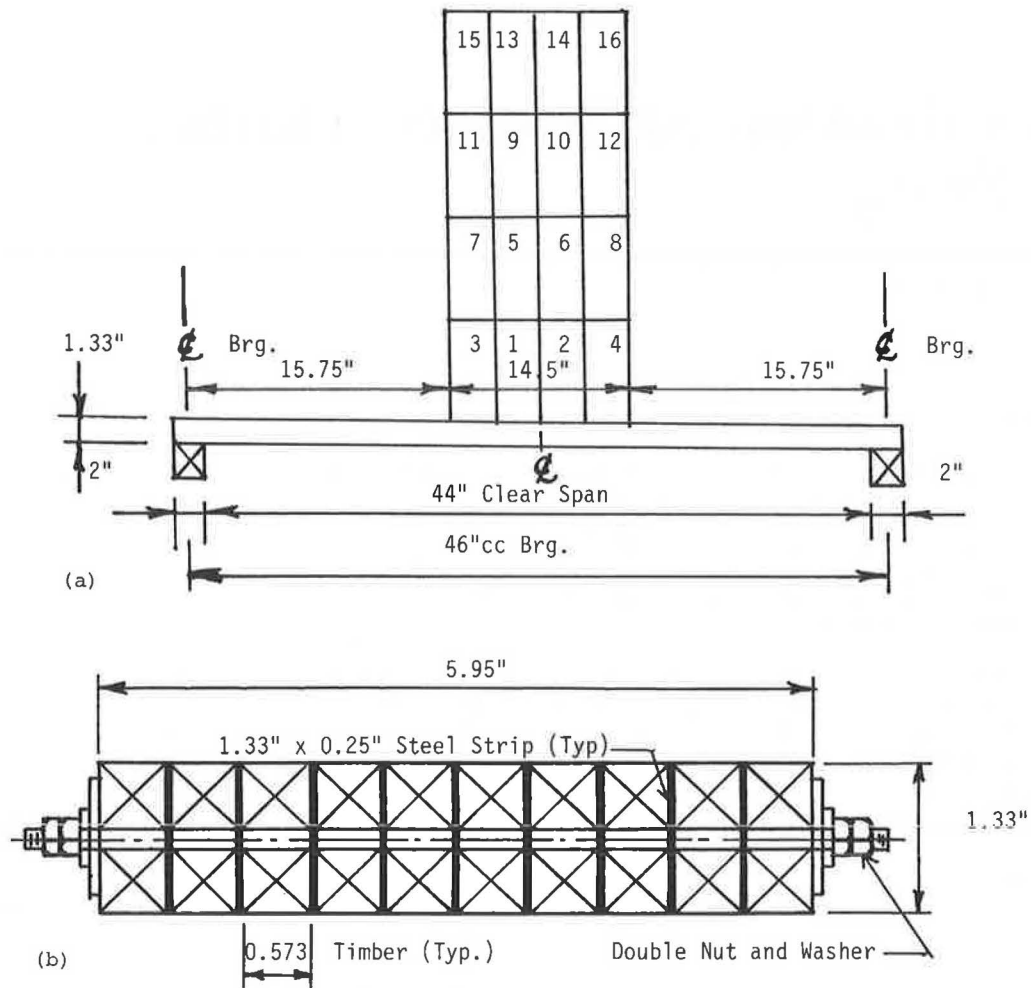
(a) bilayer model bridge with 16 concrete blocks; (b) bilayer model bridge cross section with 20 timbers and nine steel strips.
